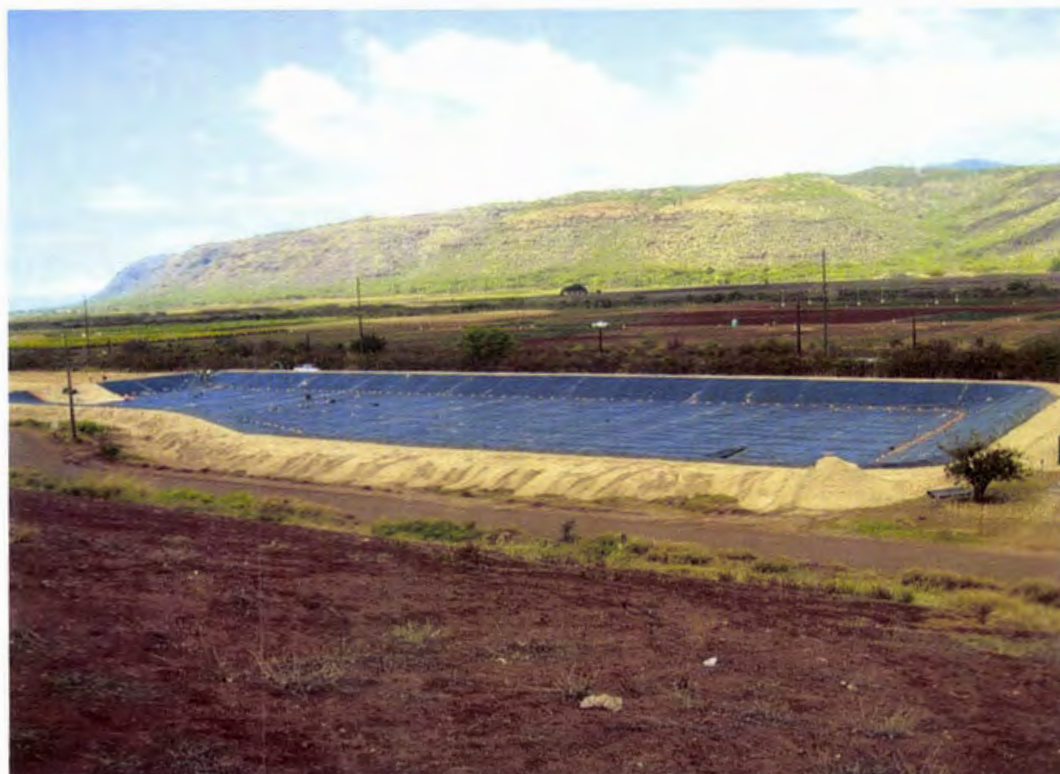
Completed subbase 60 mil HDPE geomembrane (with exception of west berm)
